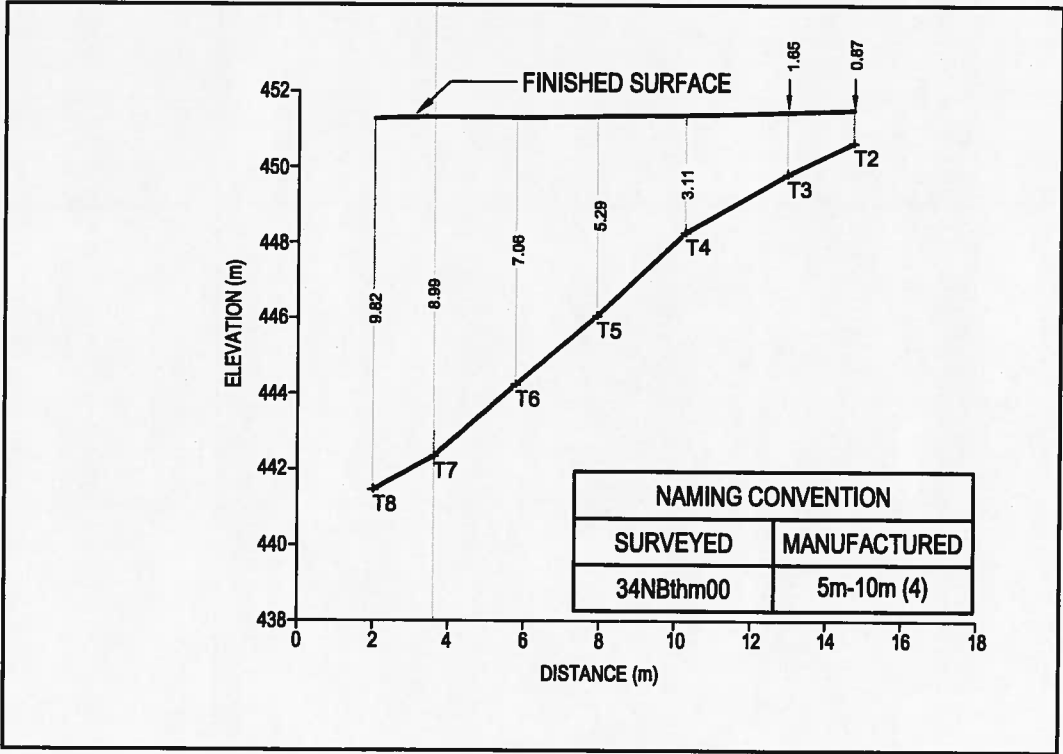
34NBthm00 (5m-10m (4)) - AS MANUFACTURED, PLAN, AND SECTION
